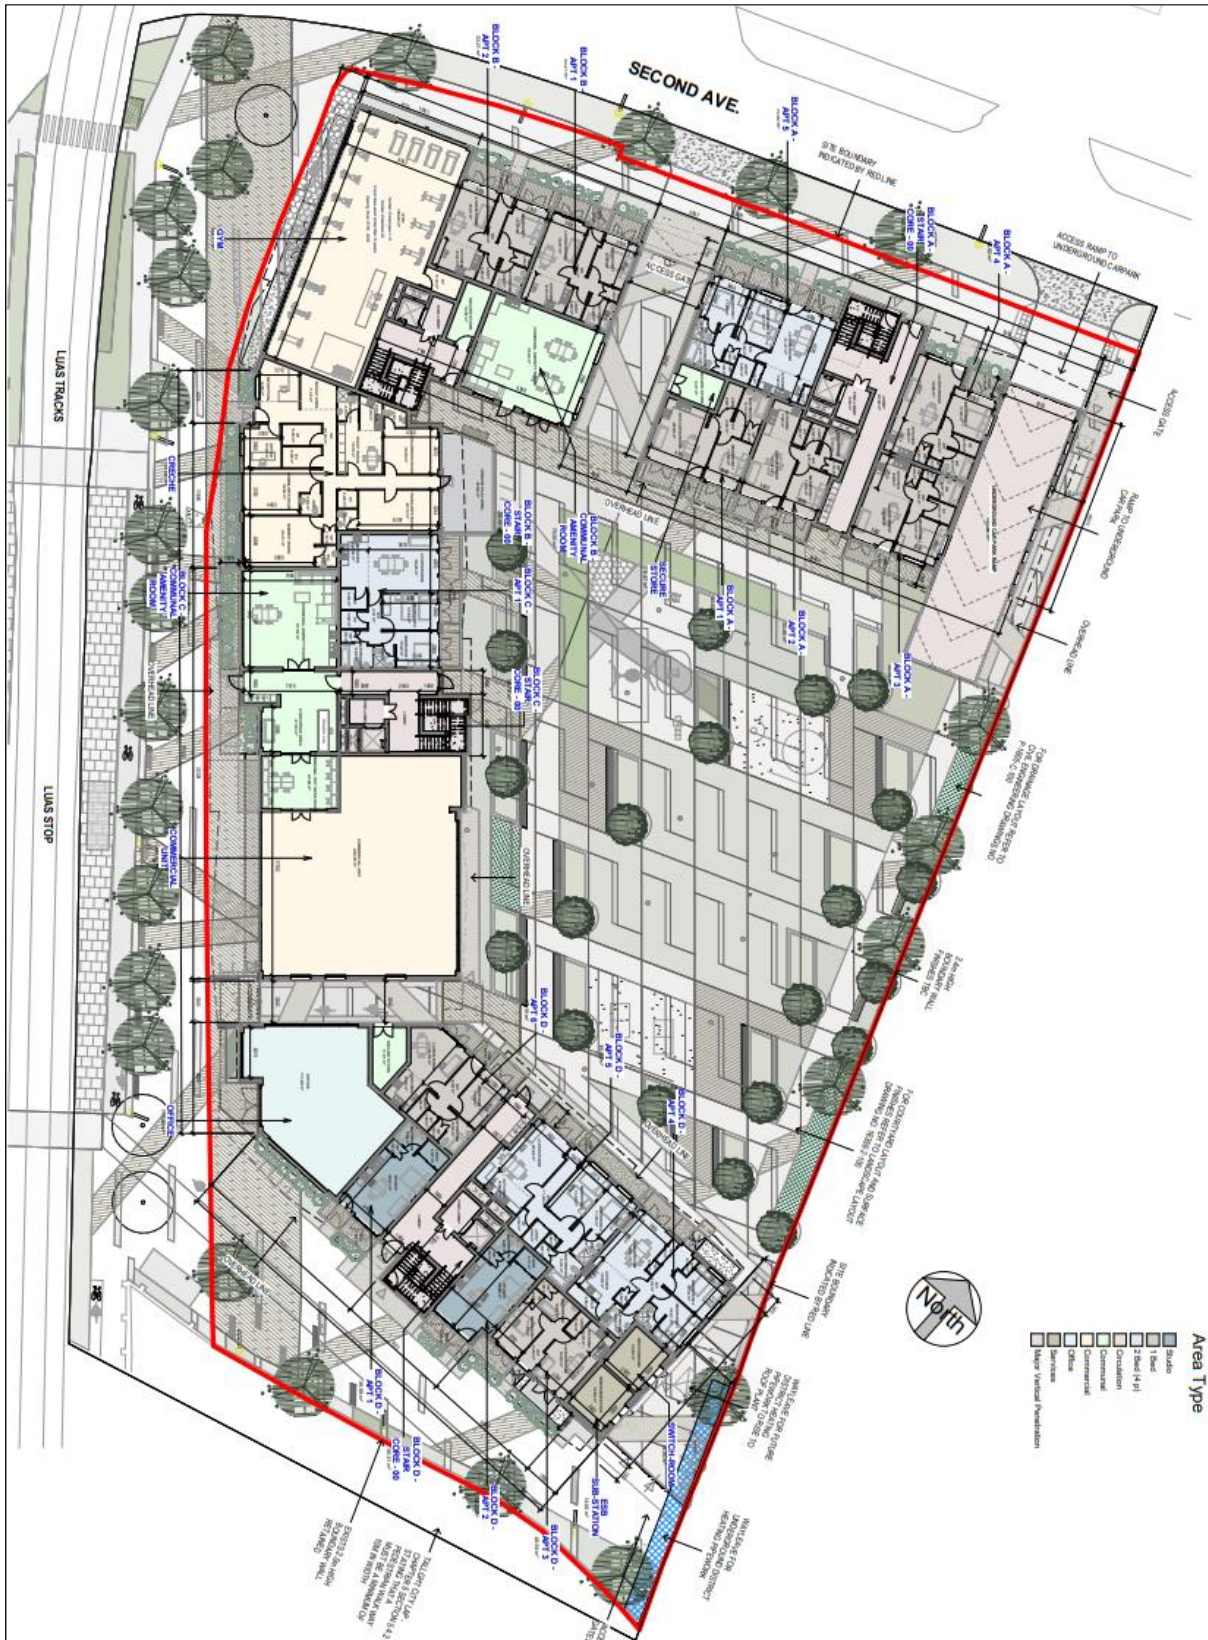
Ground floor plan of development approved under ABP Case No. 303803-19
